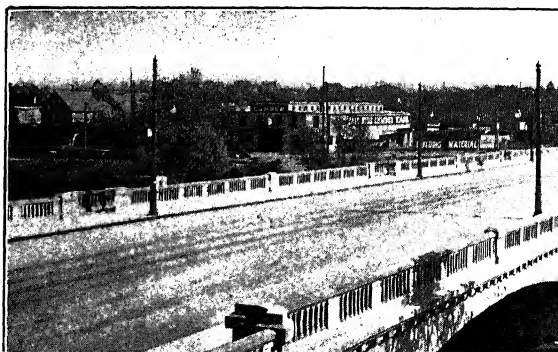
A.—Highway bridge at Ellerton, Ohio.
